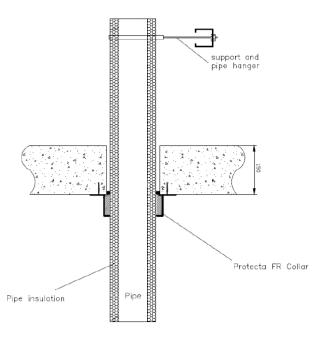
General arrangement of insulated metallic pipes penetrating a 150mm thick concrete slab and protected with Protecta FR Collar
